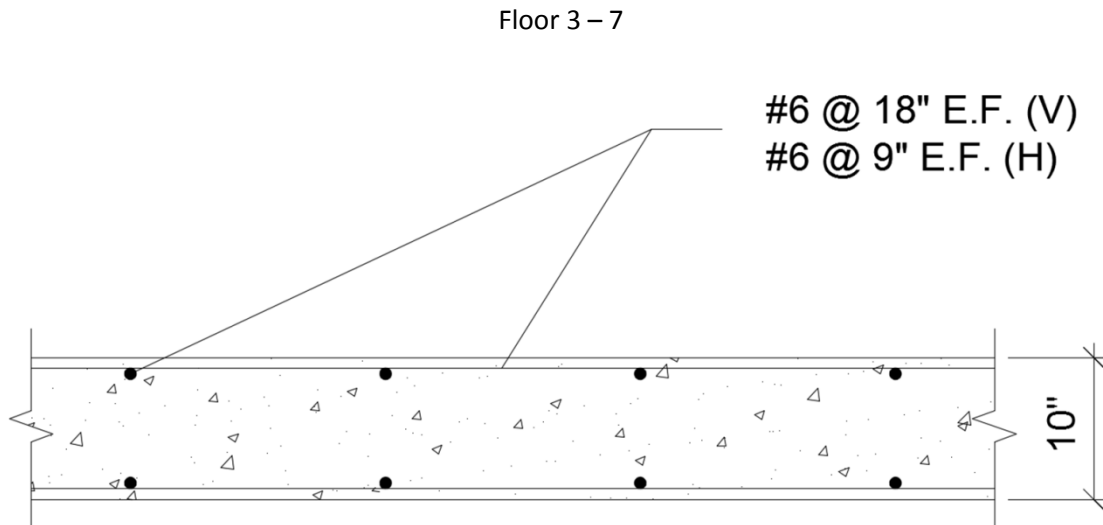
Segment of exterior wall cross-section at the 3rd – 7th floor level based on SDC D design.
